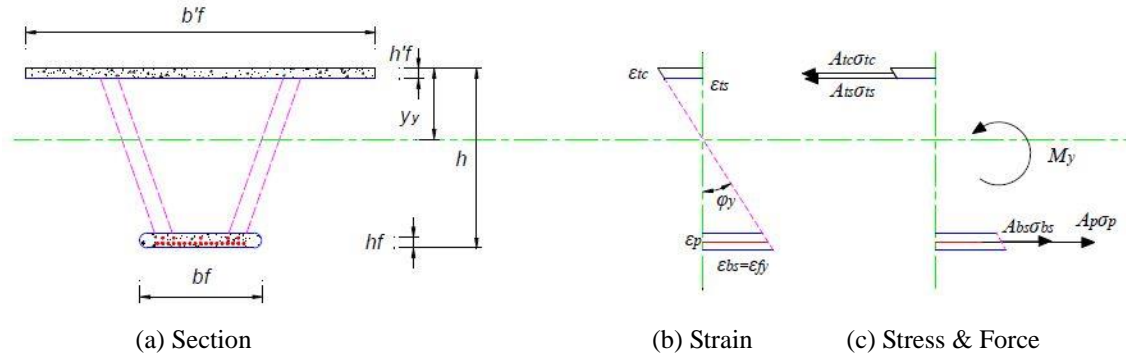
Section analysis under stage 3: Yielding of steel tube
